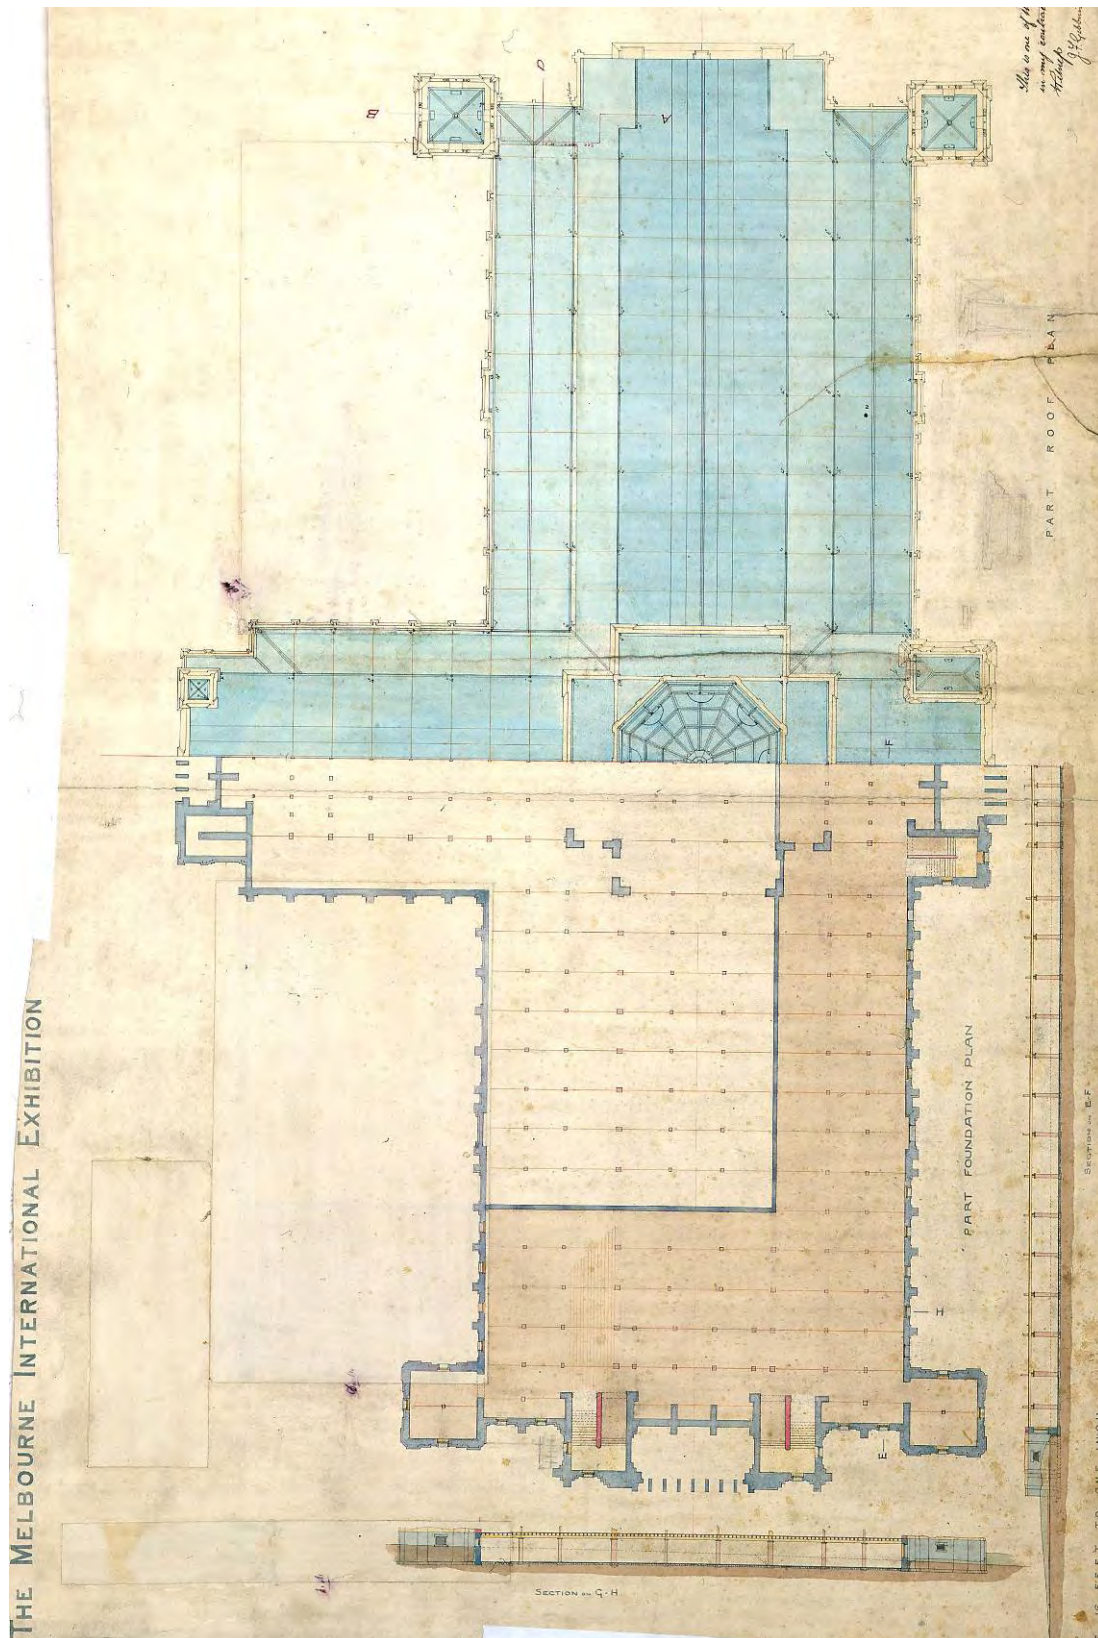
The Melbourne International Exhibition, part foundation plan, part roof plan, n.d.
